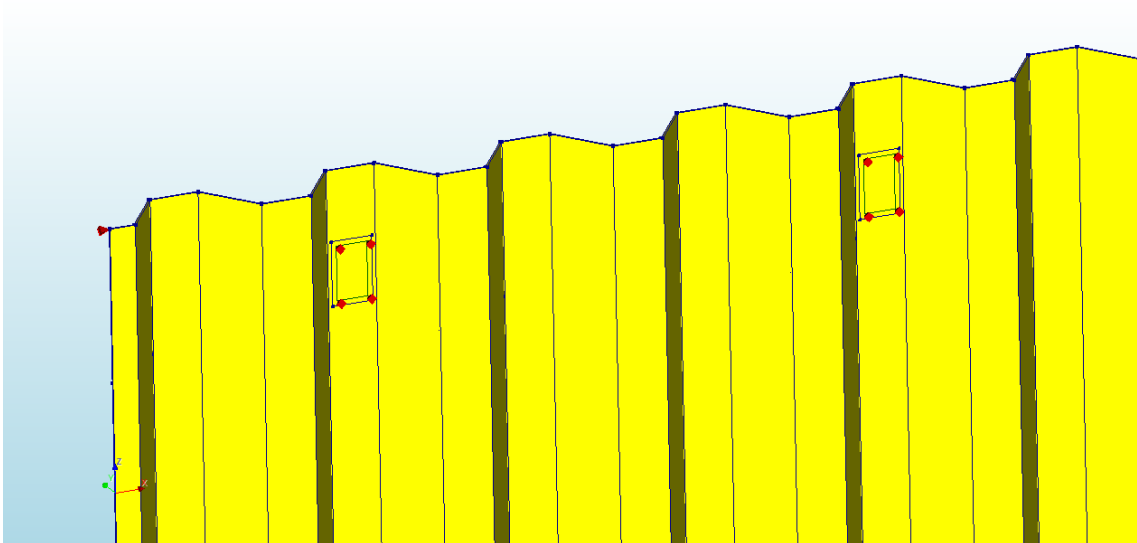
Anchor plates on sheet piles viewed from sea side. Anchor plates are modelled as supports.
